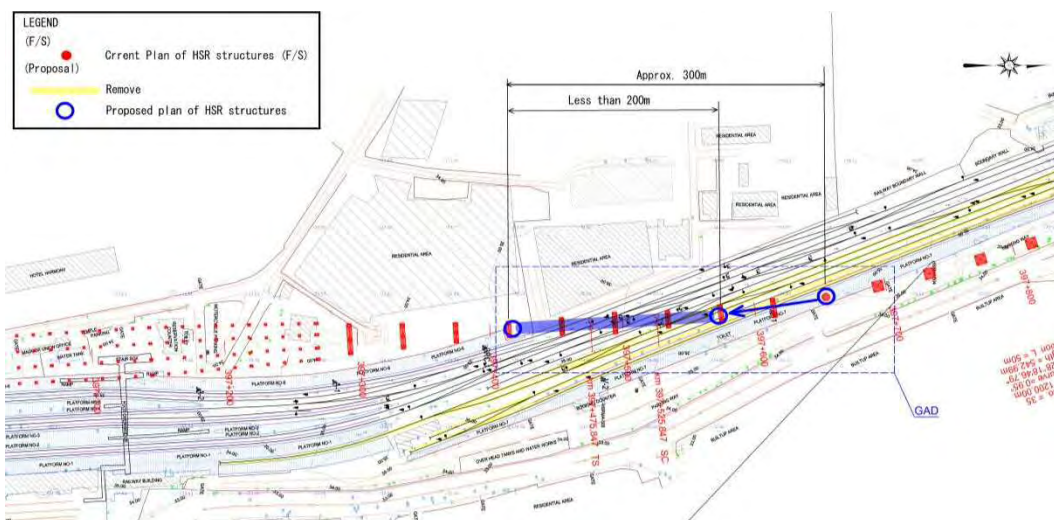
Long-Span Bridge for Crossing the Existing Lines in Vadodara Station Yard
